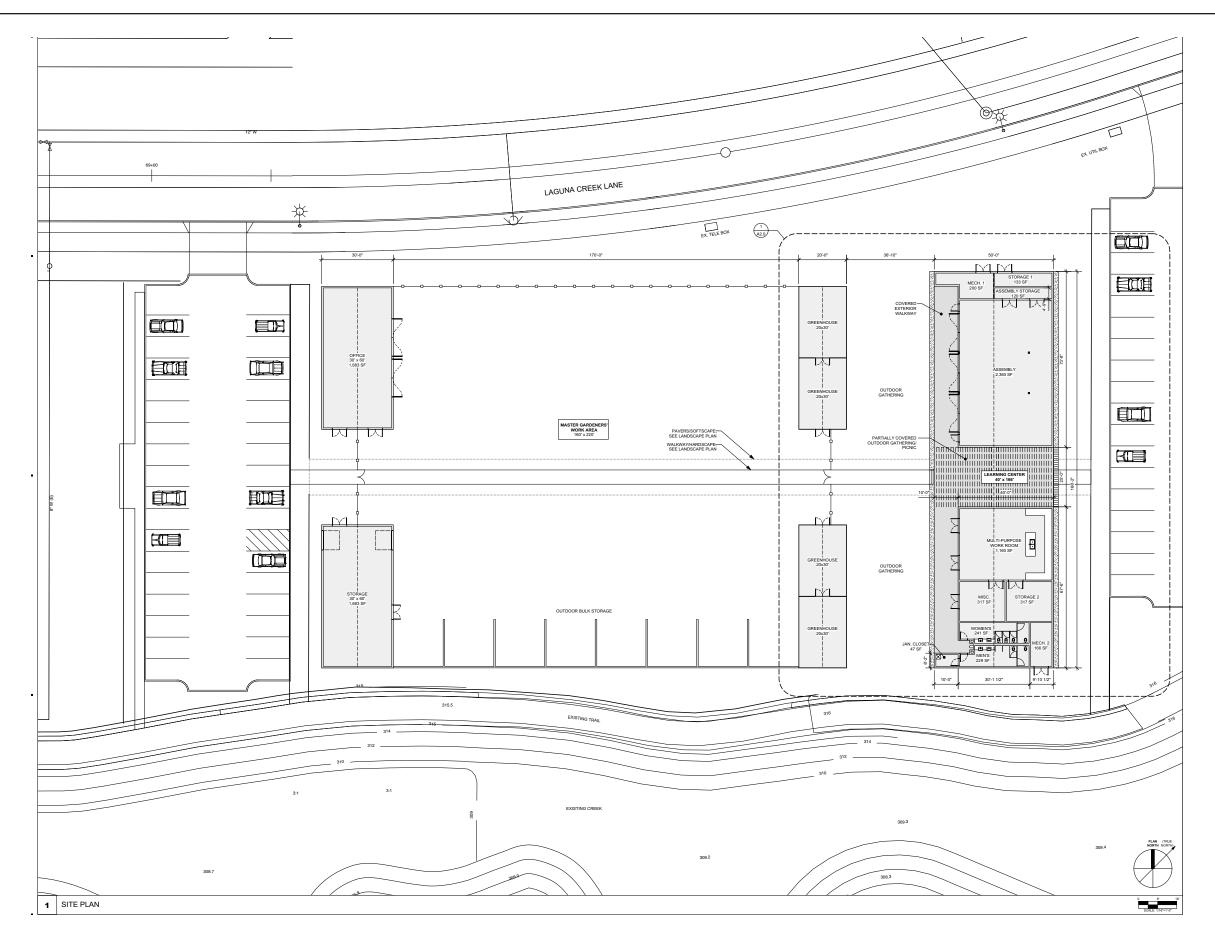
SUB-AREA 7 - ARCHITECTURAL FLOOR PLAN 1
